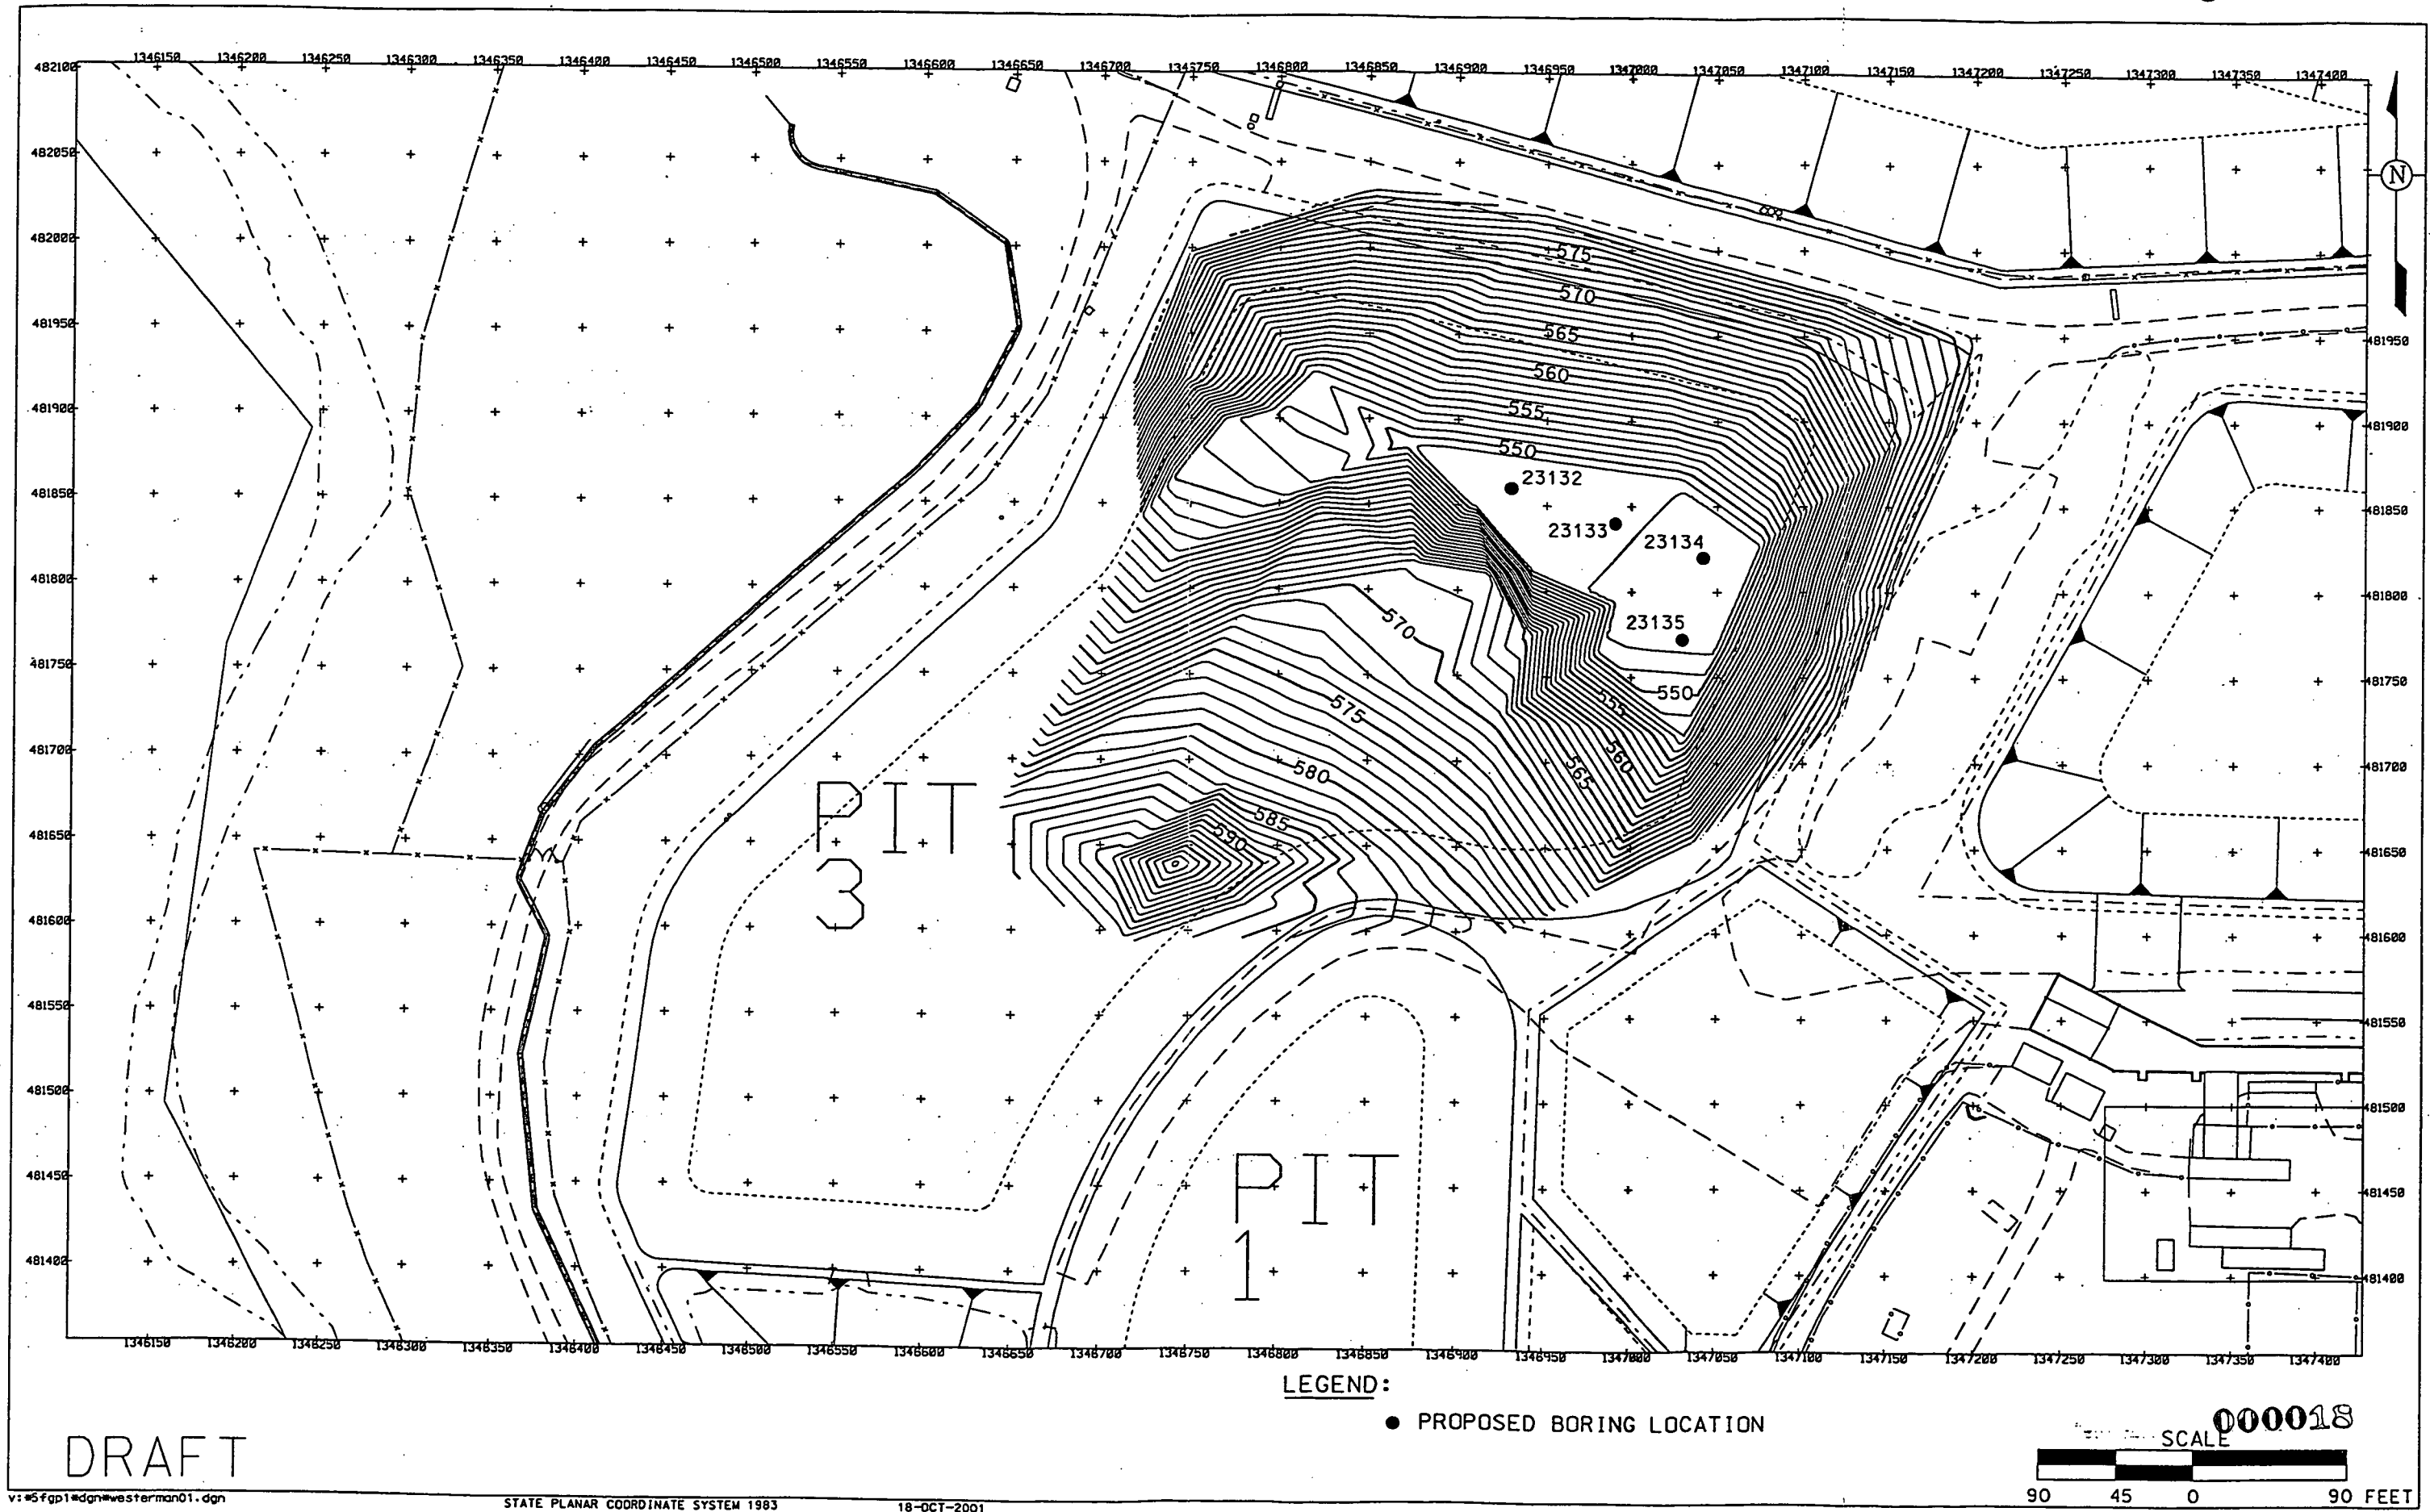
PROPOSED PIT 1 BORING LOCATIONS
